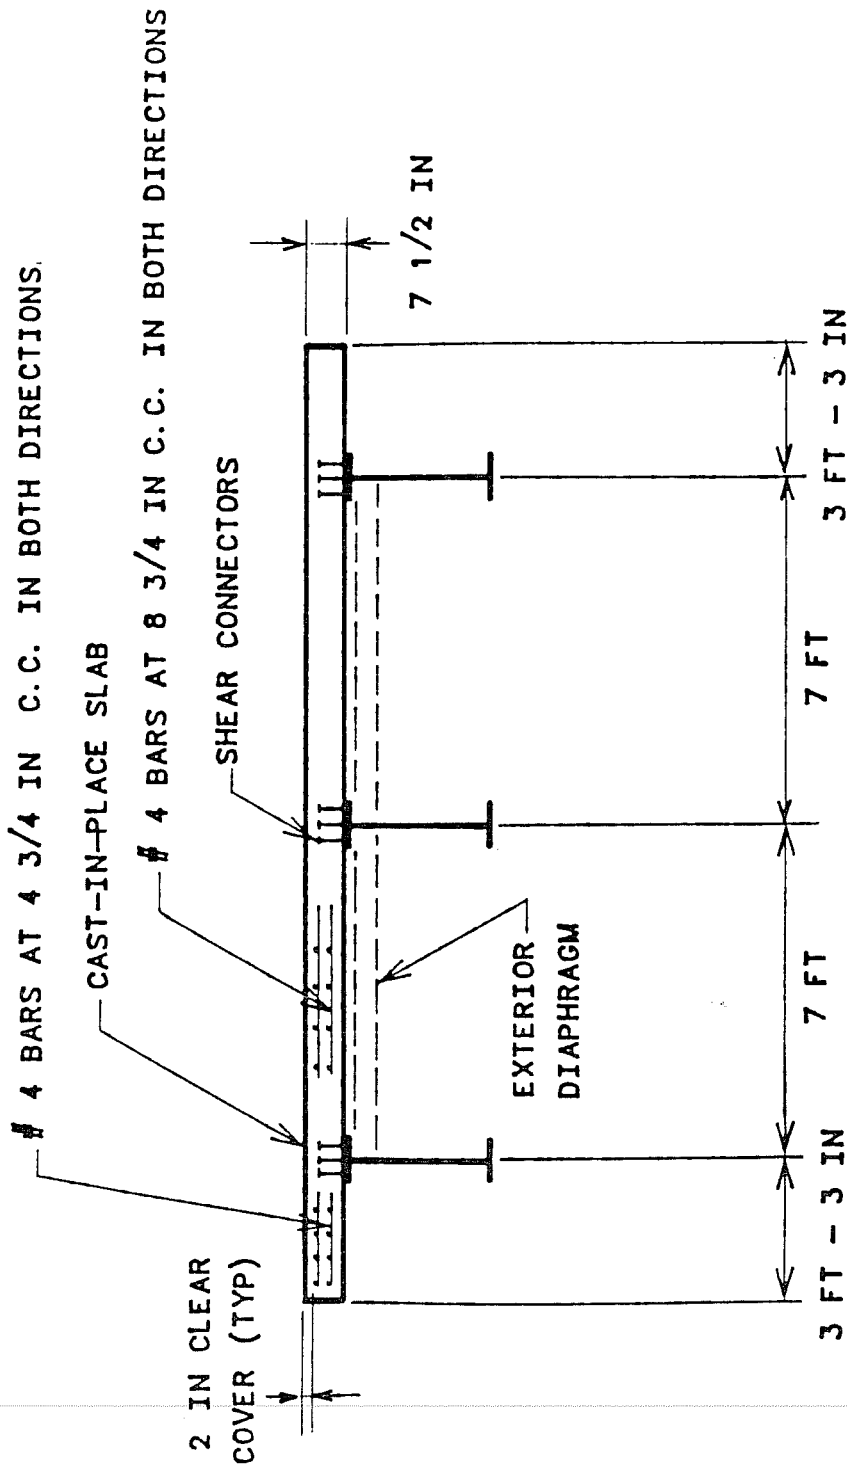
Cross section of previous test specimen showing cast-in-place deck
